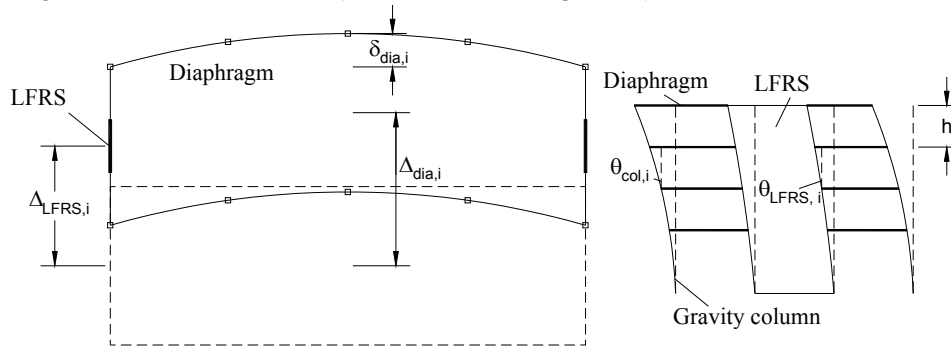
Diaphragm deformed shape: (a) plan; (b) elevation.
